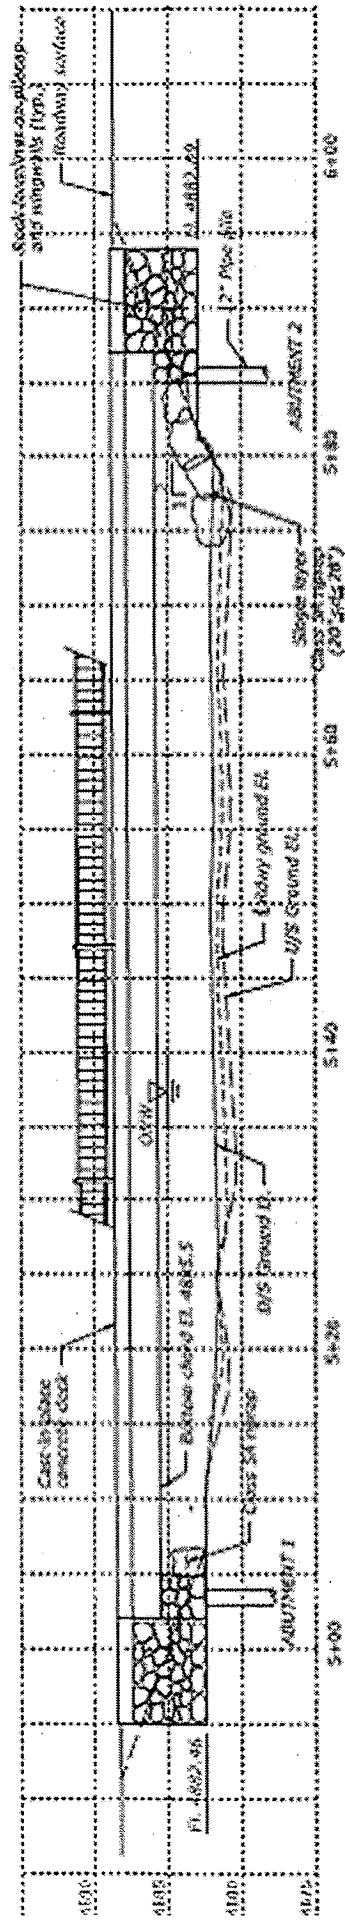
Preliminary design layout for the new Swiftcurrent Bridge; typical bridge section depicting elevations.
